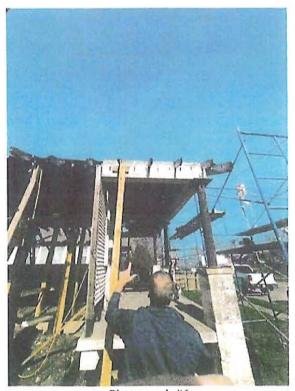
The existing roof structure is structurally unsound and needs total replacement.
